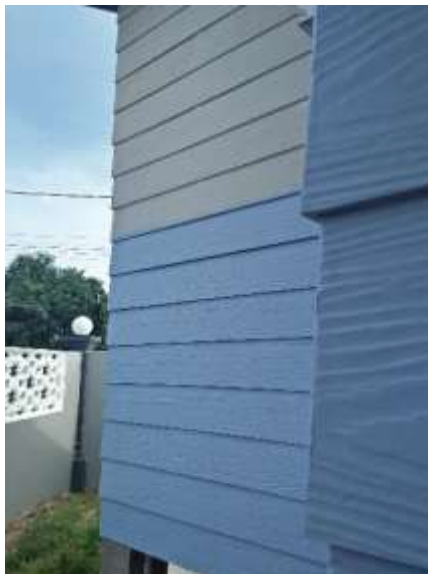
Cement-fiber wall panel used at Darul Hadith (DAHAN), Kubang Kerian, Kelantan
